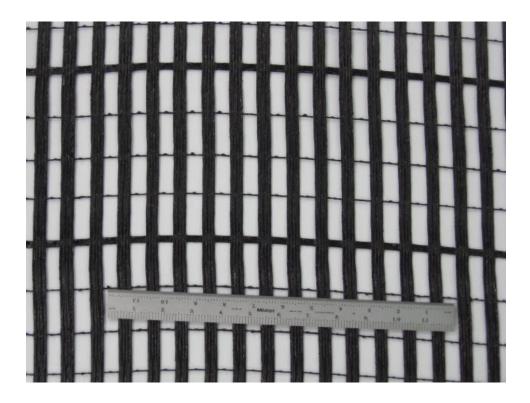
Photo of Miragrid 22XT (machine direction is perpendicular to ruler shown).
